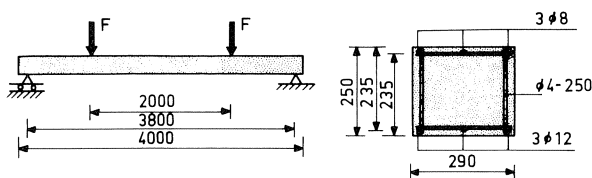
Test on beam for constant moment (dimensions mm).
